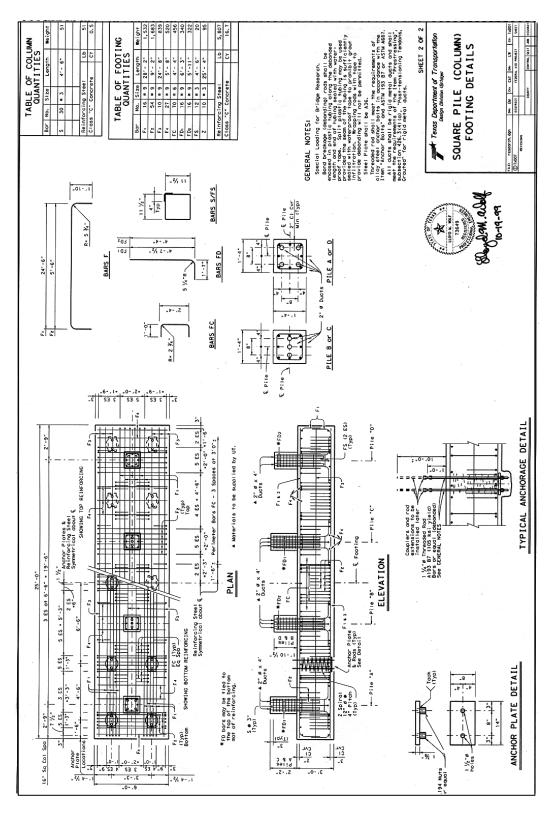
(cont.): Plan Sheet—Trestle Pile Bent
